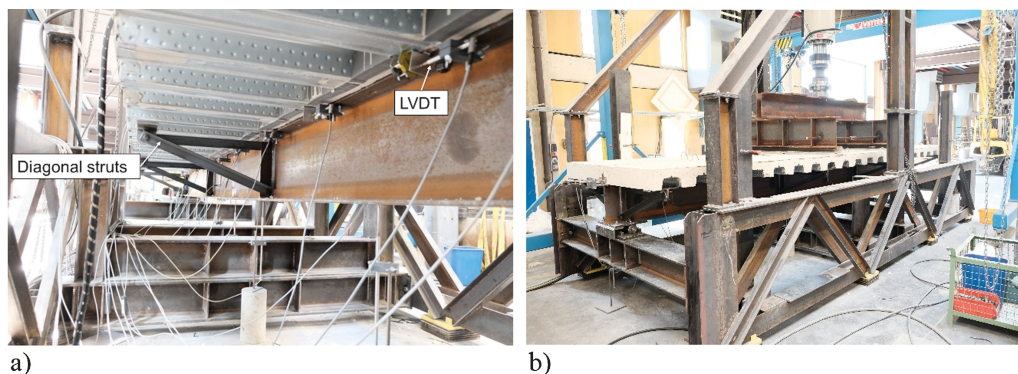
Beam B8 in the testing frame; a) view on the struts, b) view of setup
